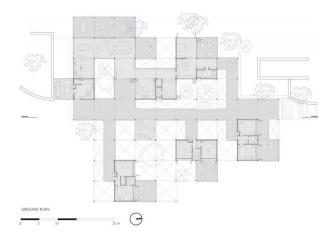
The Grid house, floor plan. (http://www.archdaily.com/28912/grid-house-forte-gimenes-marcondes-ferraz-arquitetos/)
